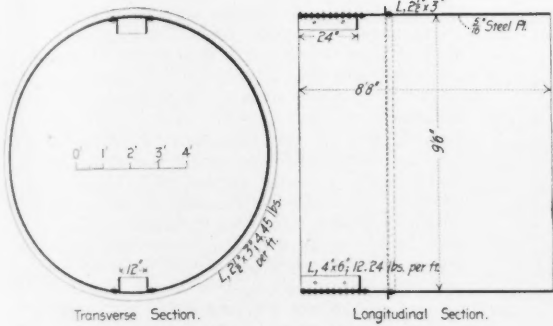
STEEL THIMBLE IN FRONT WALL OF POWER HOUSE.
